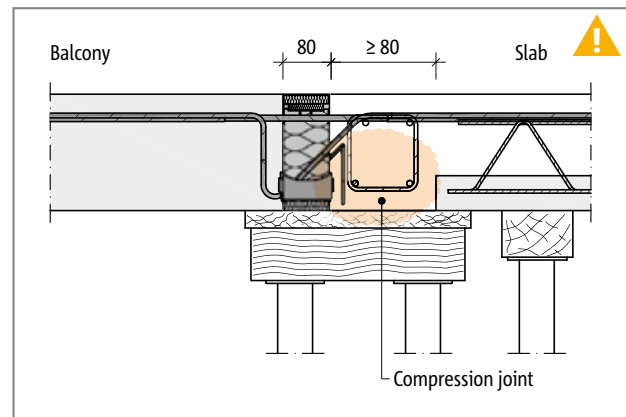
Schöck Isokorb® T type K-E, K-T: Installation in conjunction with pre-fabricated slab with edge beams, compression joint on the floor side
